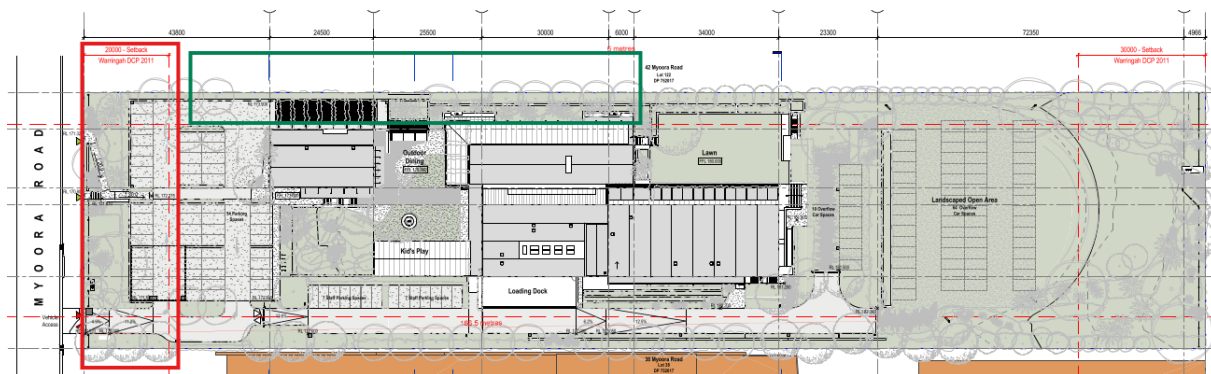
Site plan, showing car parking within the front 20m setback as highlighted in red and basement carparking, roof canopy and stage within the 7.5m side setback highlighted in green
